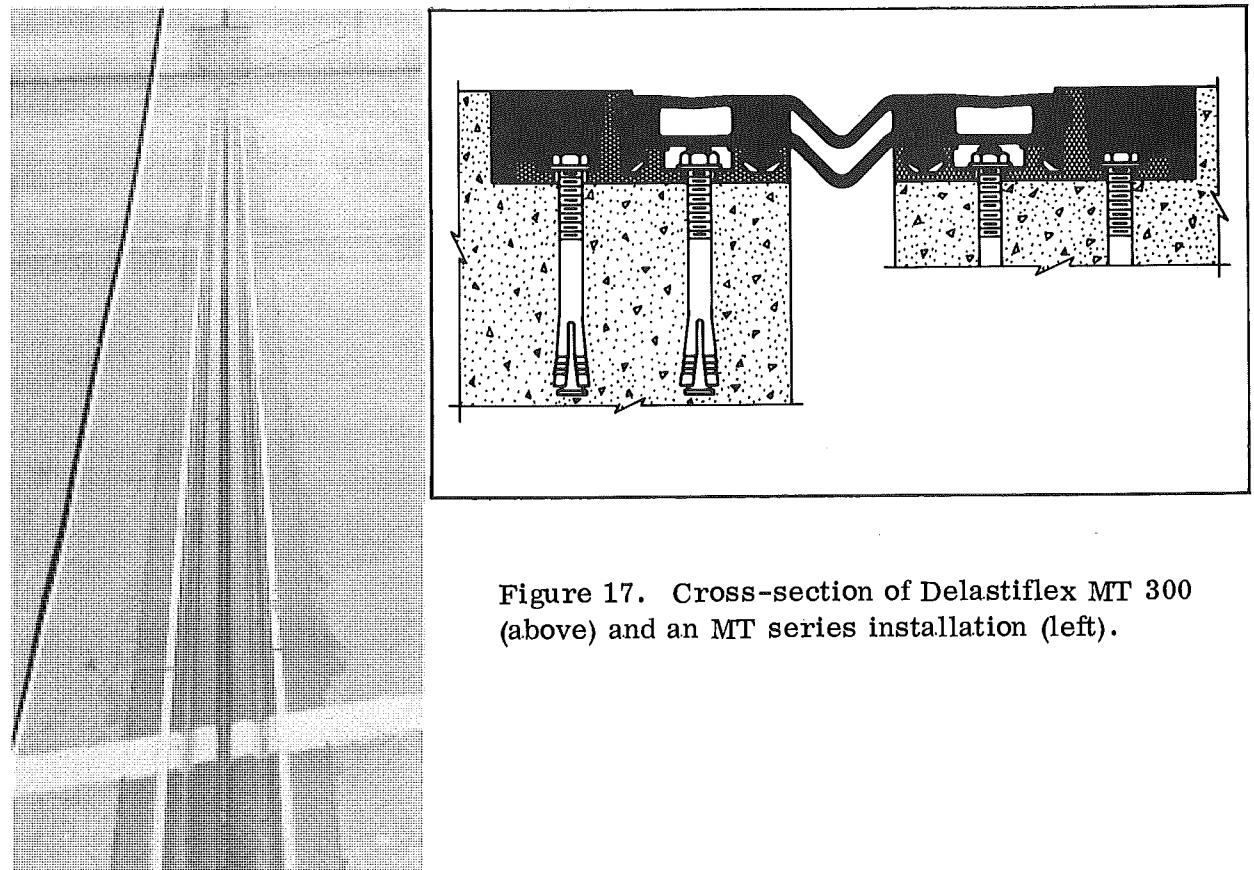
Cross-section of Delastiflex MT 300 (above) and an MT series installation (left).
